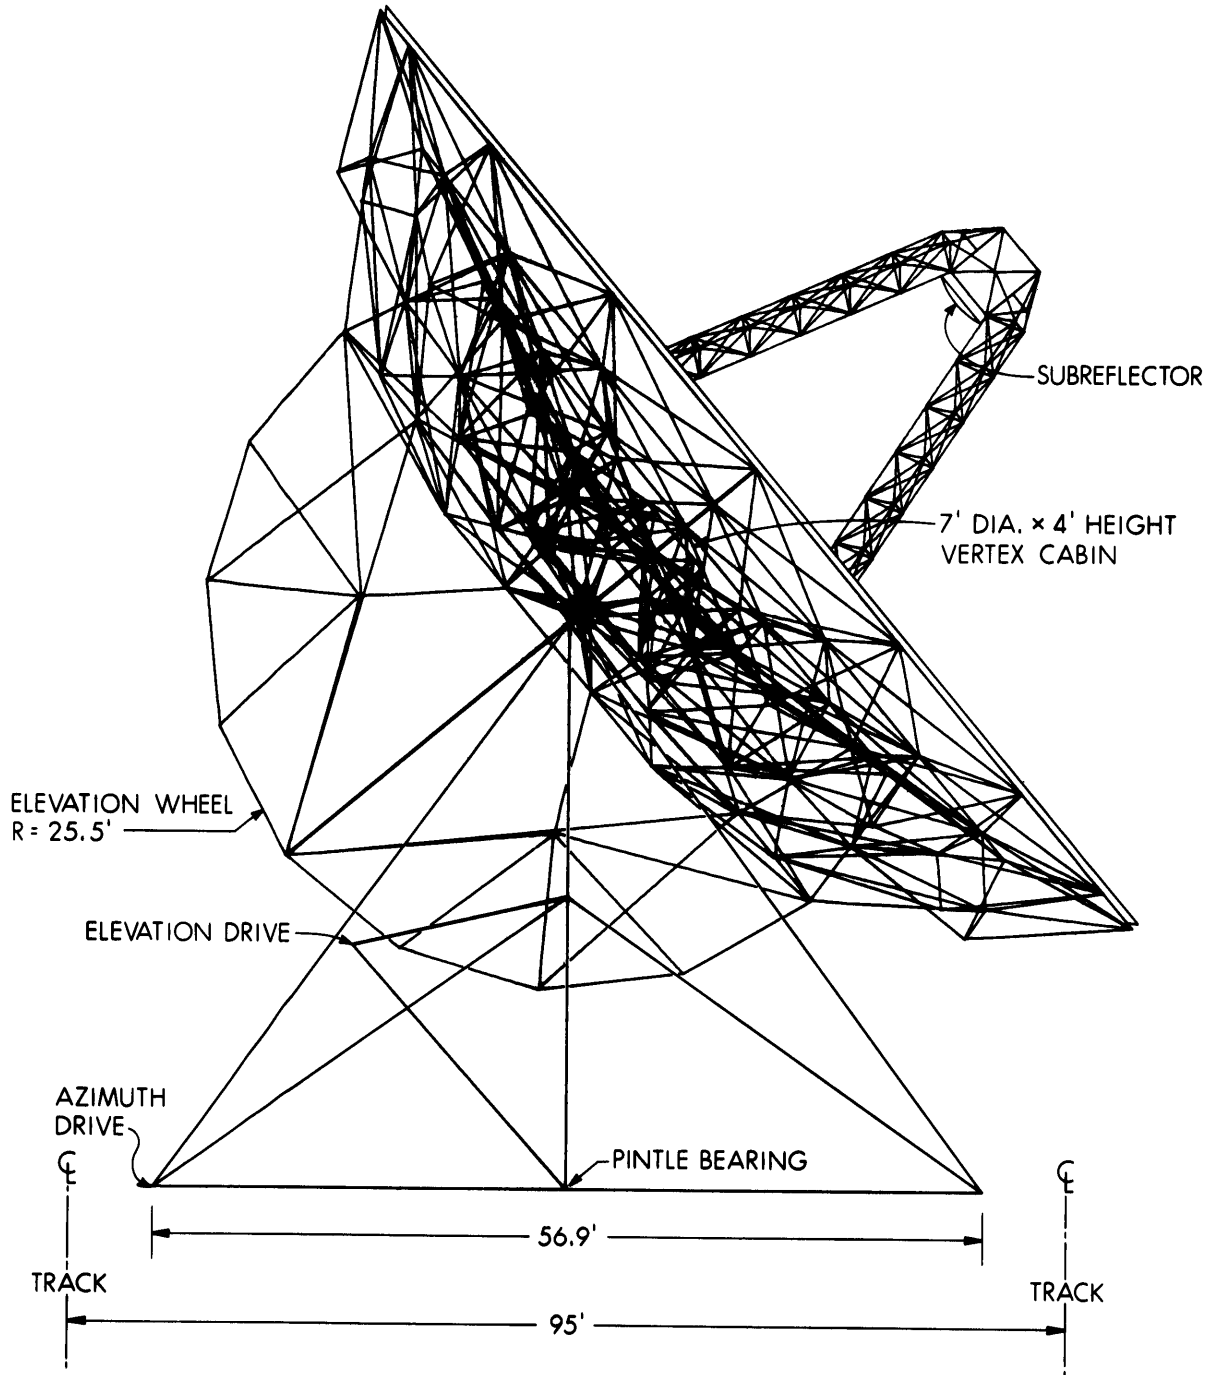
Side view of the 25-m radio telescope pointing at about 45° elevation angle.
